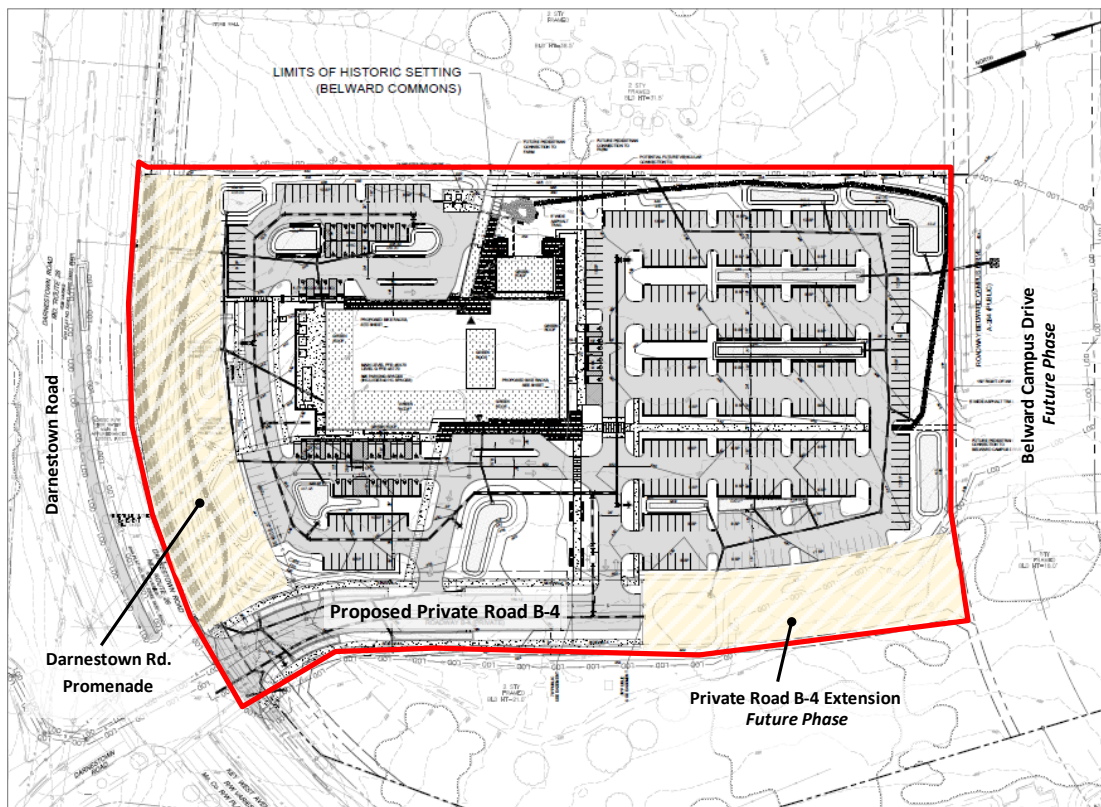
Proposed Site Plan (Subject Property outlined in red)
